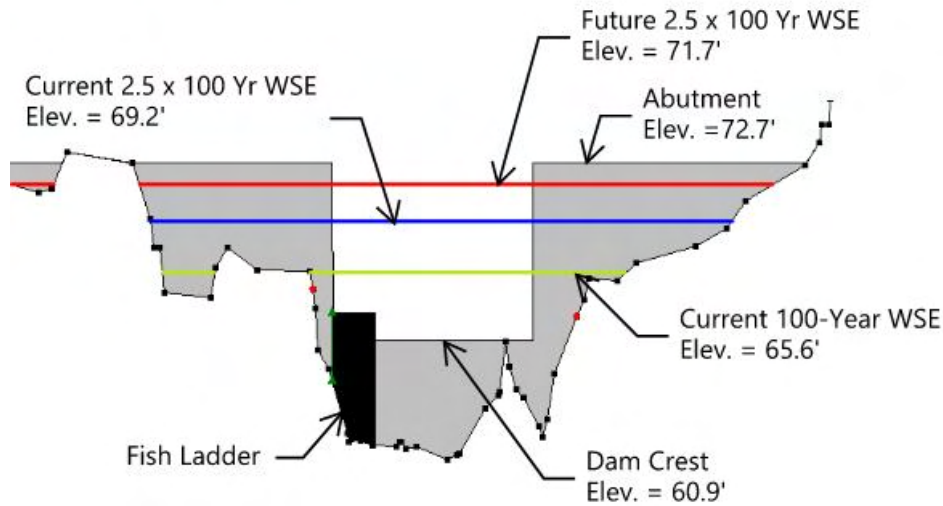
Alternative 1 - Raise Top of Dam Concept Cross Section
